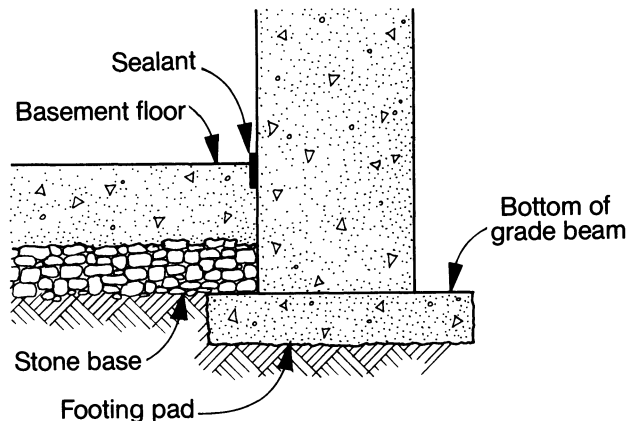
Earth pressure transfer from basement wall to slab on ground.
